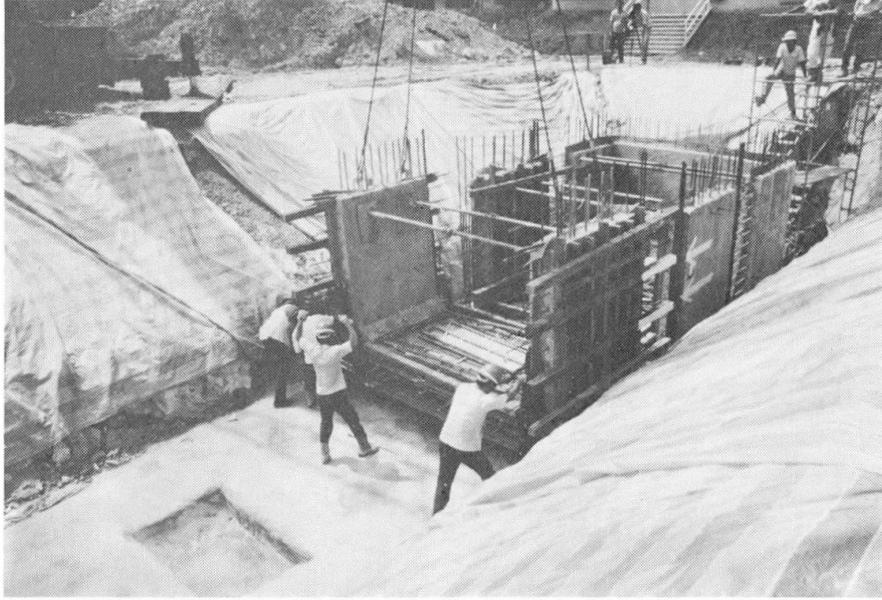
Precast segments being placed on a prepared bed on the open cut at certain spacing.
